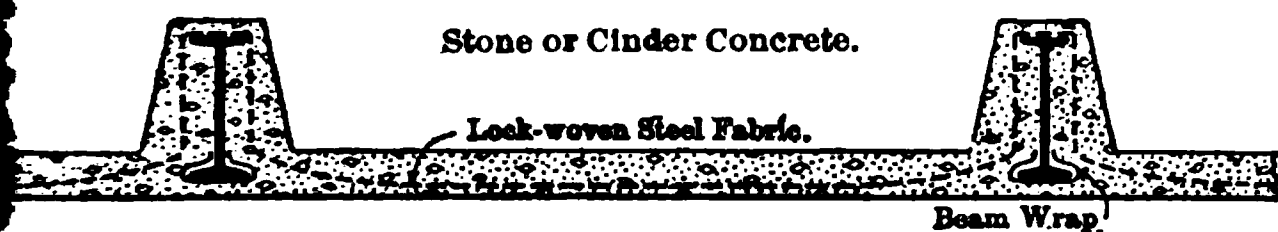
Concrete Ceiling-slab Reinforced with Lock-woven Fabric
